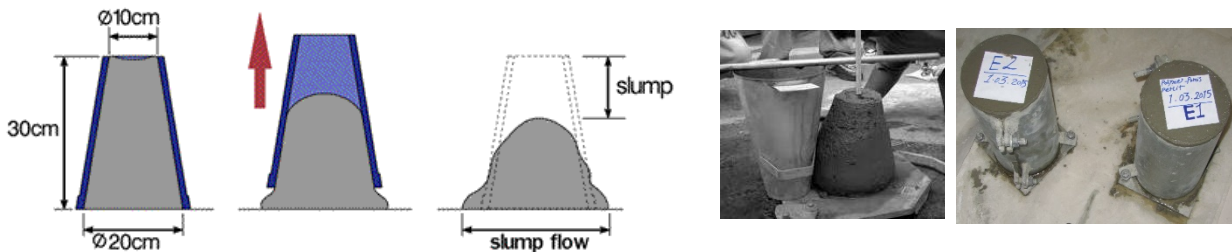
Filling the slump cone, cone removal, measurement of polymer concrete slump
